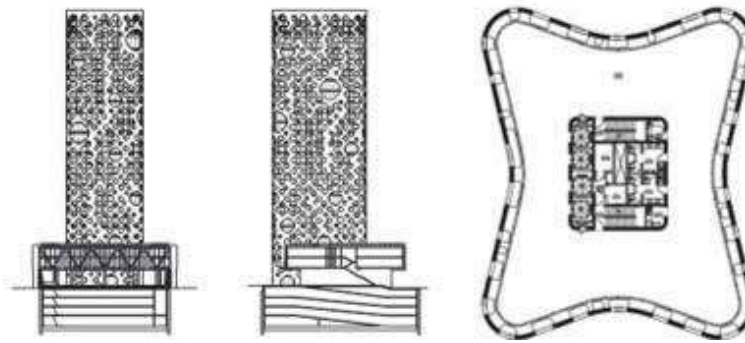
O-14 Tower in Dubai, elevation view and typical floor plan
